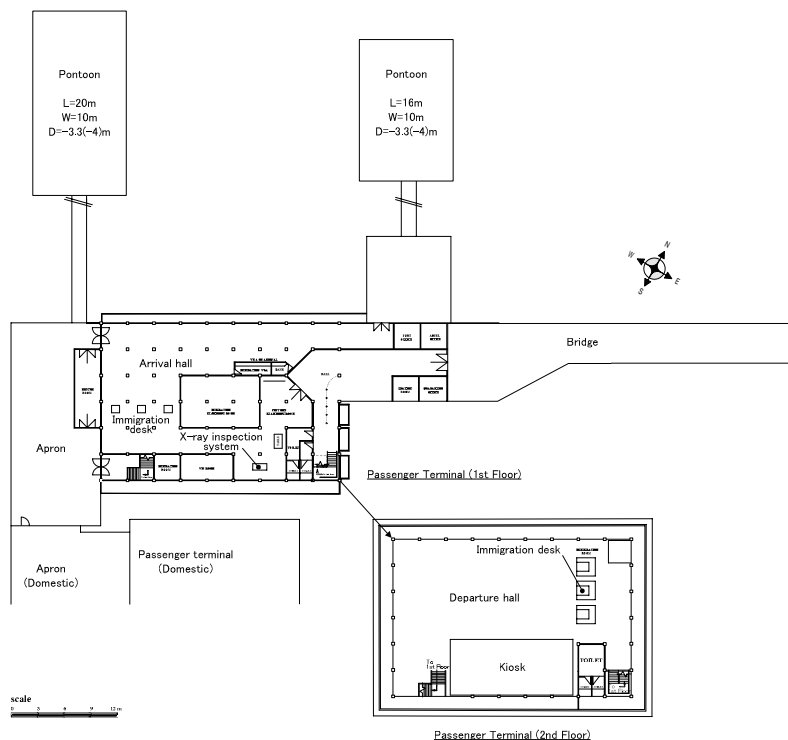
Layout Plan (International Passenger Terminal)
